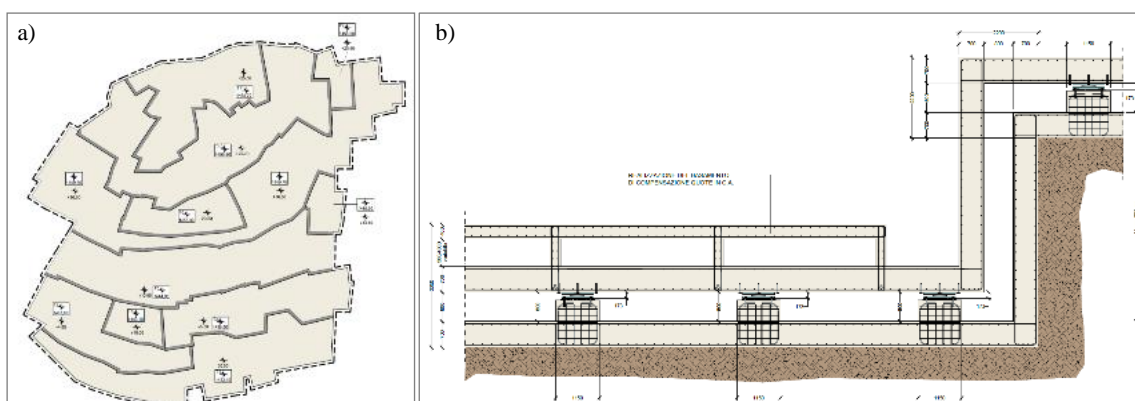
a) elevations of the stepped isolated plate; b) section of the isolated plate and sub-structures.
